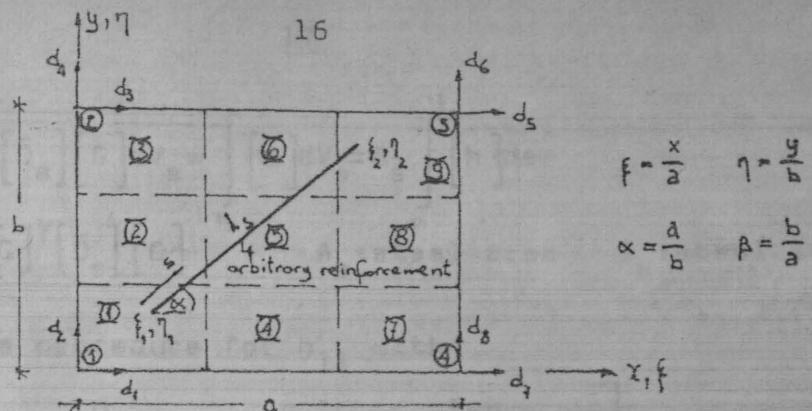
Reinforced Concrete Element (After Colville and Abbasi (5))
